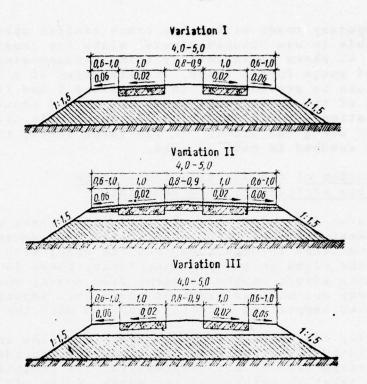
Gauge, prefabricated pavements made of bitumen-mineral slabs (dimensions in m).
